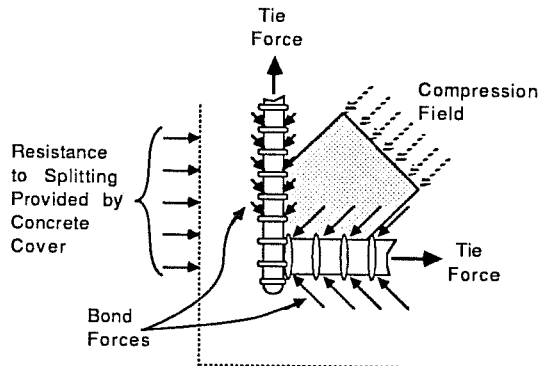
Force Transfer Mechanisms at Intersection of Straight Bar with U Reinforcement
